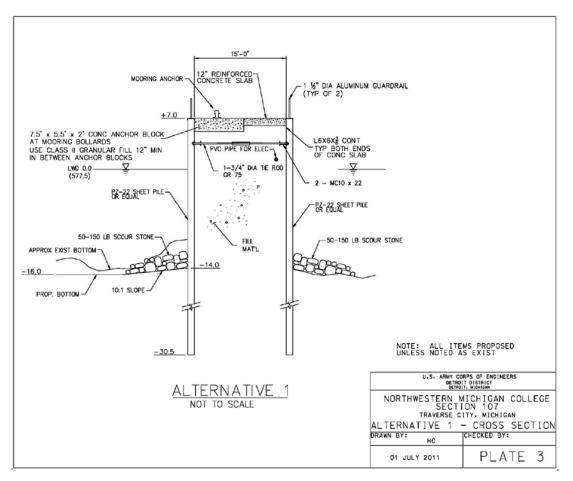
Cross-section of Alternative 1 double steel sheet pile breakwater
